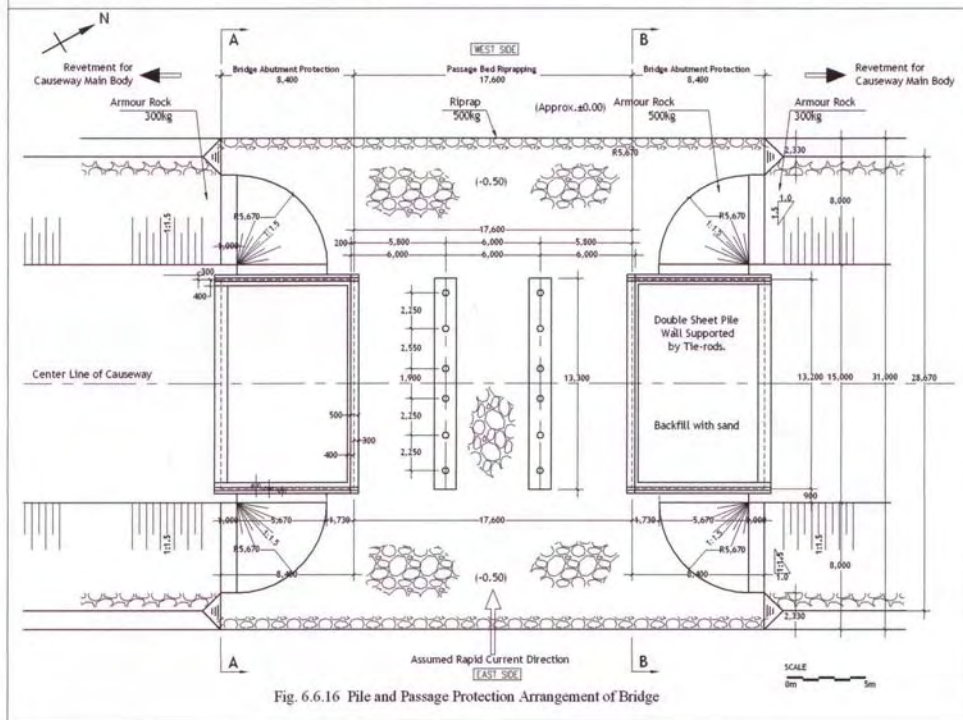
Pile and Passage Protection Arrangement of Bridge
